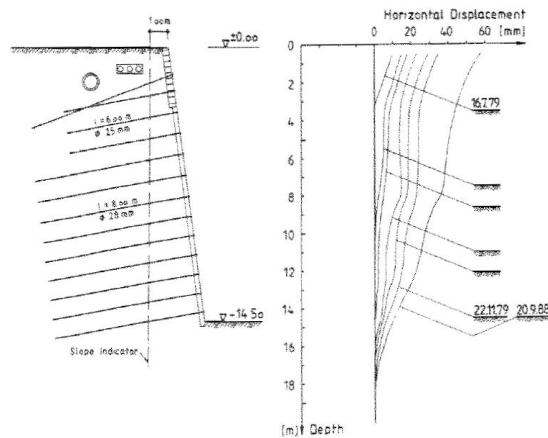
Horizontal wall deformation base on different excavation level (Stocker and Riedinger 1990)
